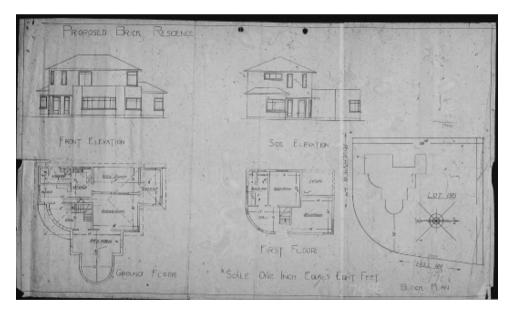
Architectural drawing of proposed brick residence. Note that drawing does not include the lower ground floor plan. (Source: BP 7986)
